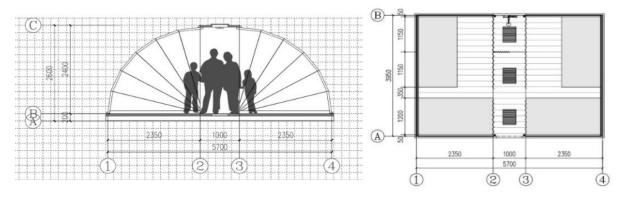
Dimensional drawings of small-scale shelters (Source: APSEC)
